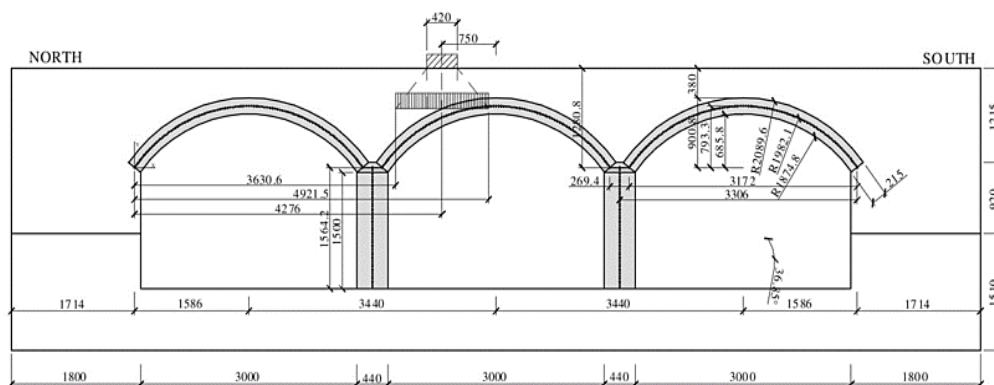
Geometry of the bridge (mm) and load disposition (De Felice, 2009)
